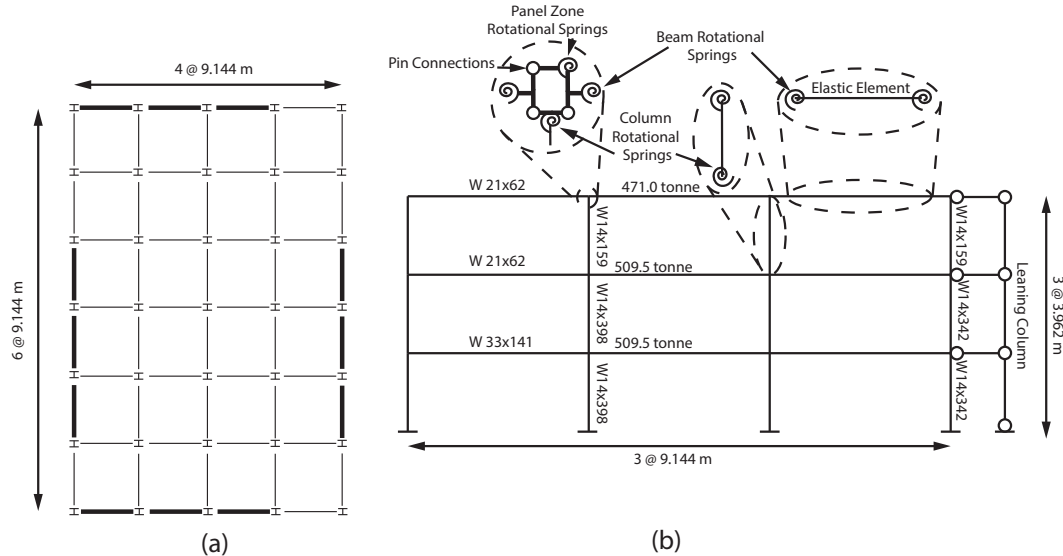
(a) Plan view of archetype building, (b) Elevation view of archetype building with modeling details
